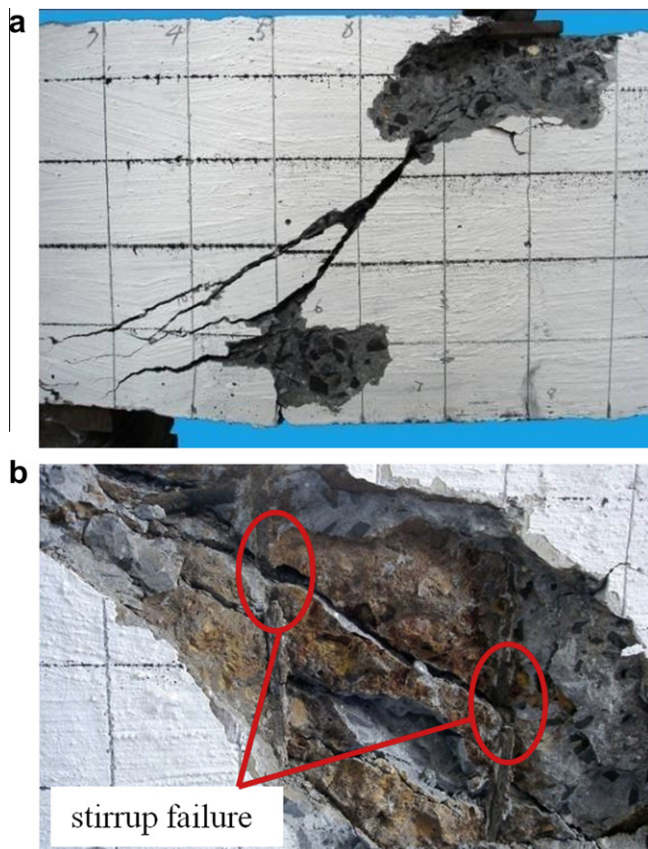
Two typical failure modes observed in experiments. (a) concrete crushing and (b) stirrup failure.
